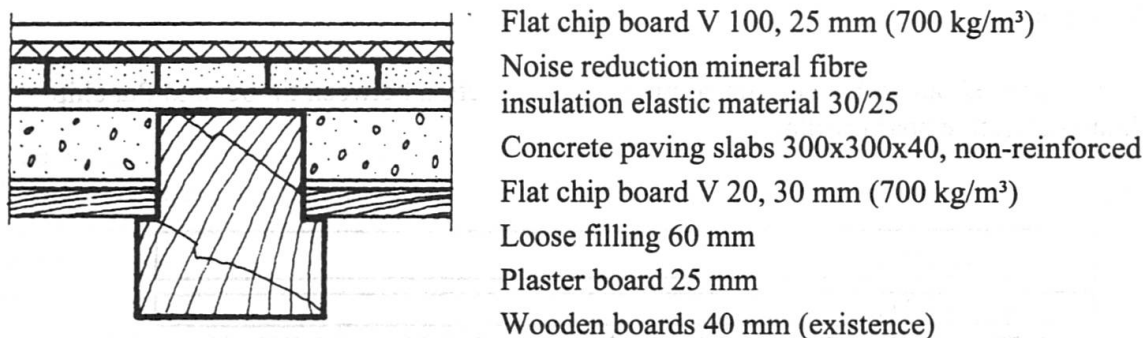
'Salzburger Decke' - 'Salzburg-type floor' after renovation
